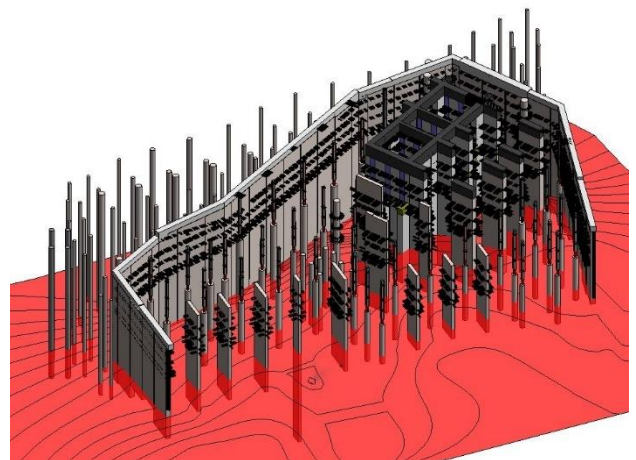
A 3D snapshot from the BIM model showing PRW, In-Ground Structures and tower foundations in relation to the Rock levels
